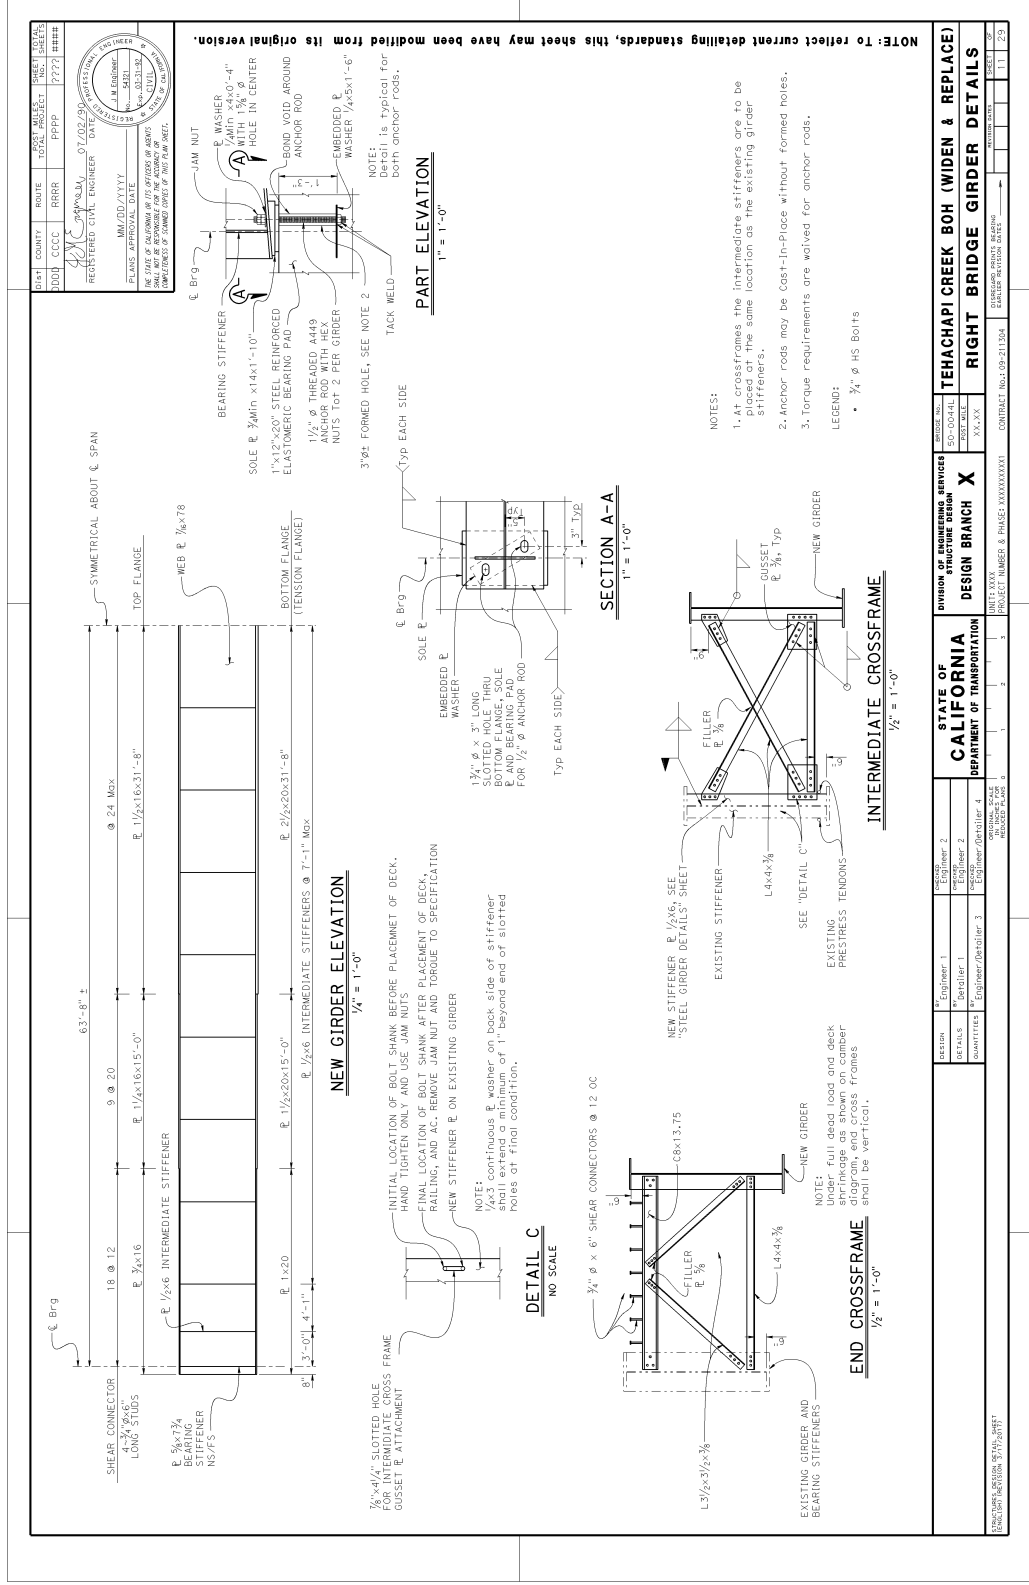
A.A.15 Steel Girder Bridge Detailing Example 15
